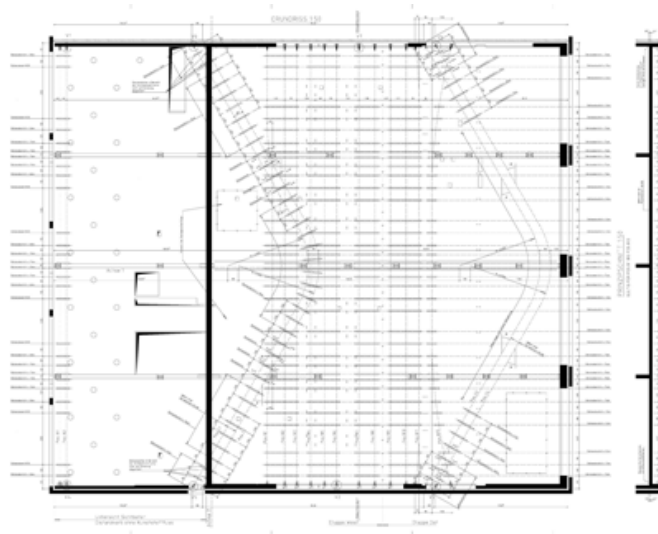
Plan of the gym roof of the Volta school in Basel (drawing by Jürg Conzett)
